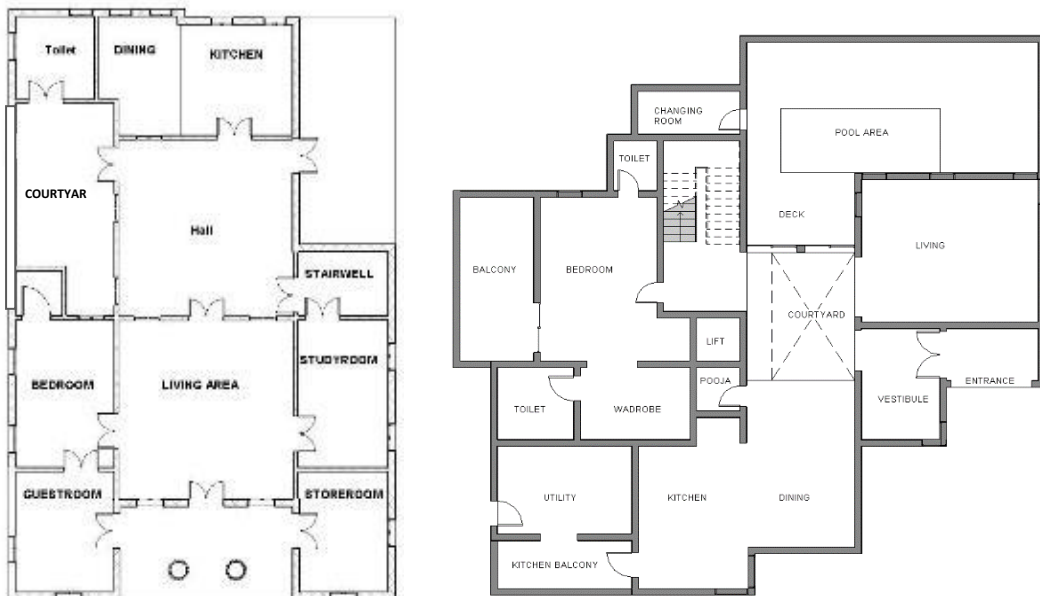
Comparison of building footprints. House 1 (left) has a linear plan, house 8 (right) is non-linear and greater perimeter.
